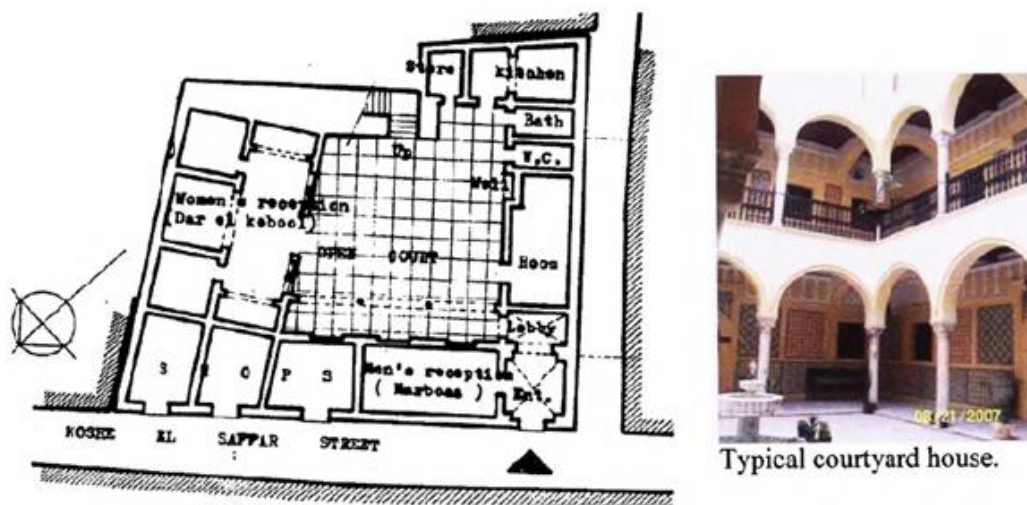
the floor plan and courtyard of a typical Libyan traditional house.
